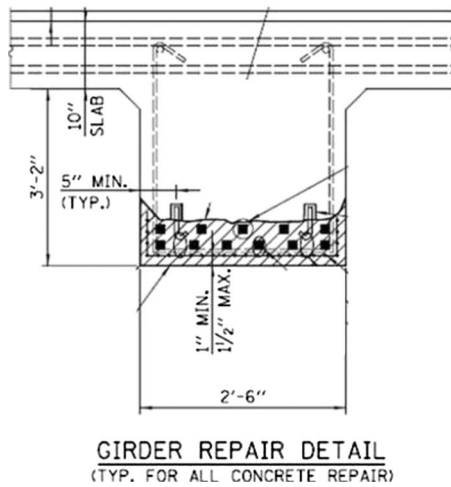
Repair of exterior girder prior to installation of the posttensioning system
